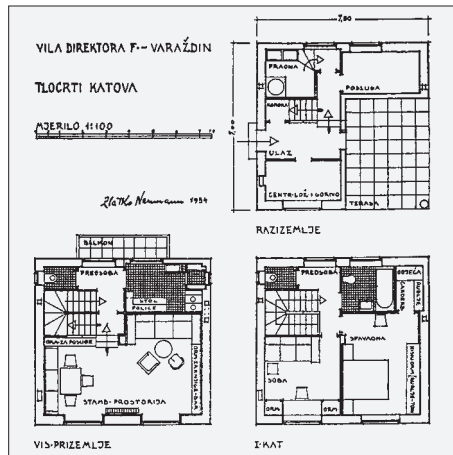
THREE-STORY DETACHED HOUSE FRIEDLÄNDER, FLOOR PLANS
